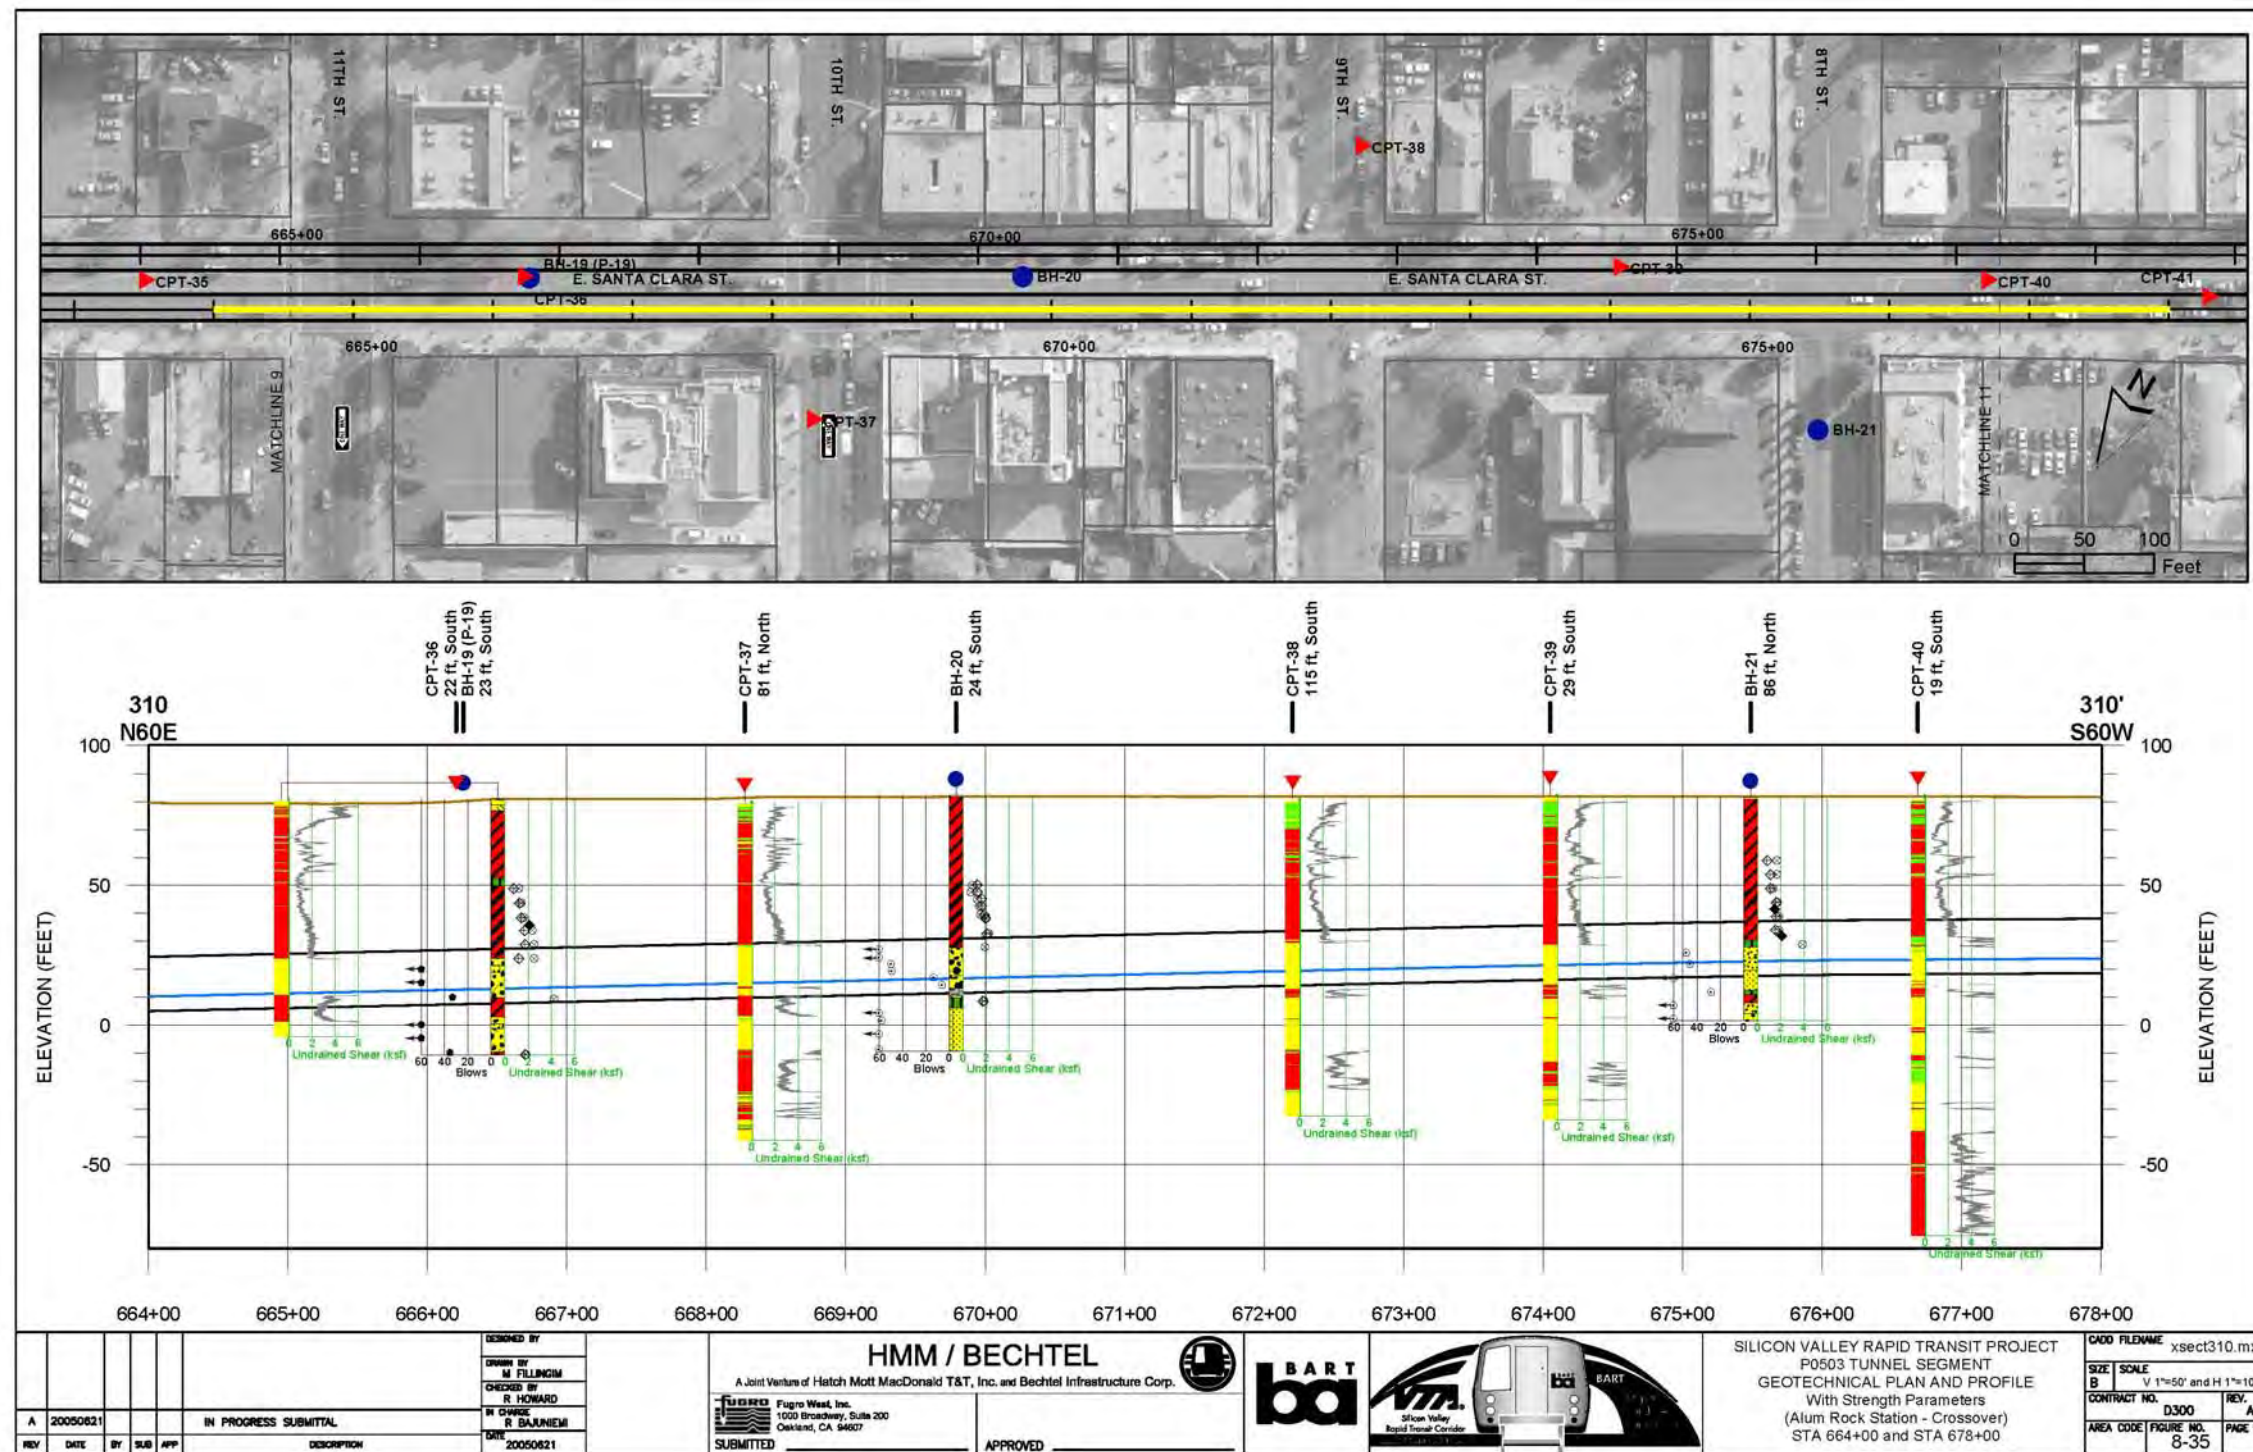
Geotechnical Plan and Profile with Strength Parameters: 664+00 to 678+00.
